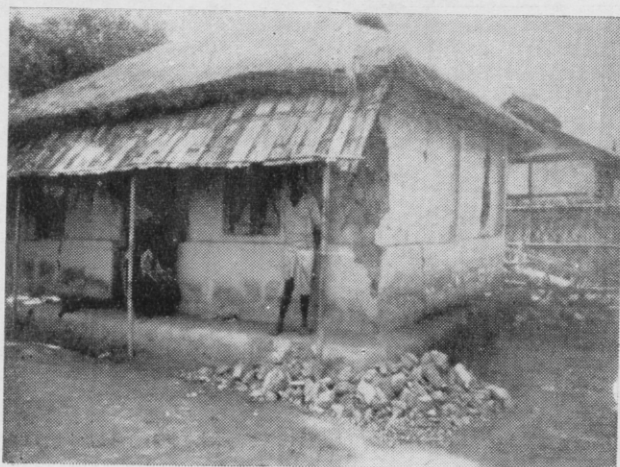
Damage to mud house with thick walls and thatched roof of very good timber cum bamboo frame at Kajdhar II-five people sleeping inside buried to death due to collapse of walls in this house.
